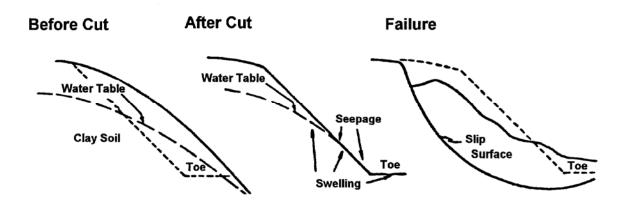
Typical cut slope failure mechanism in clay soils.
